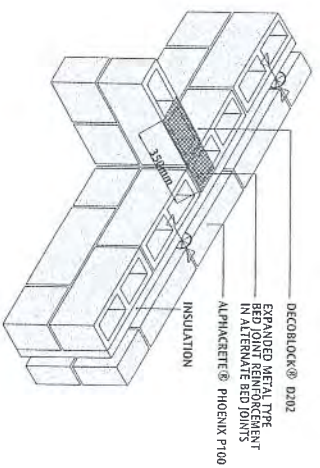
Load bearing Cavity Wall & Internal Wall Junction
